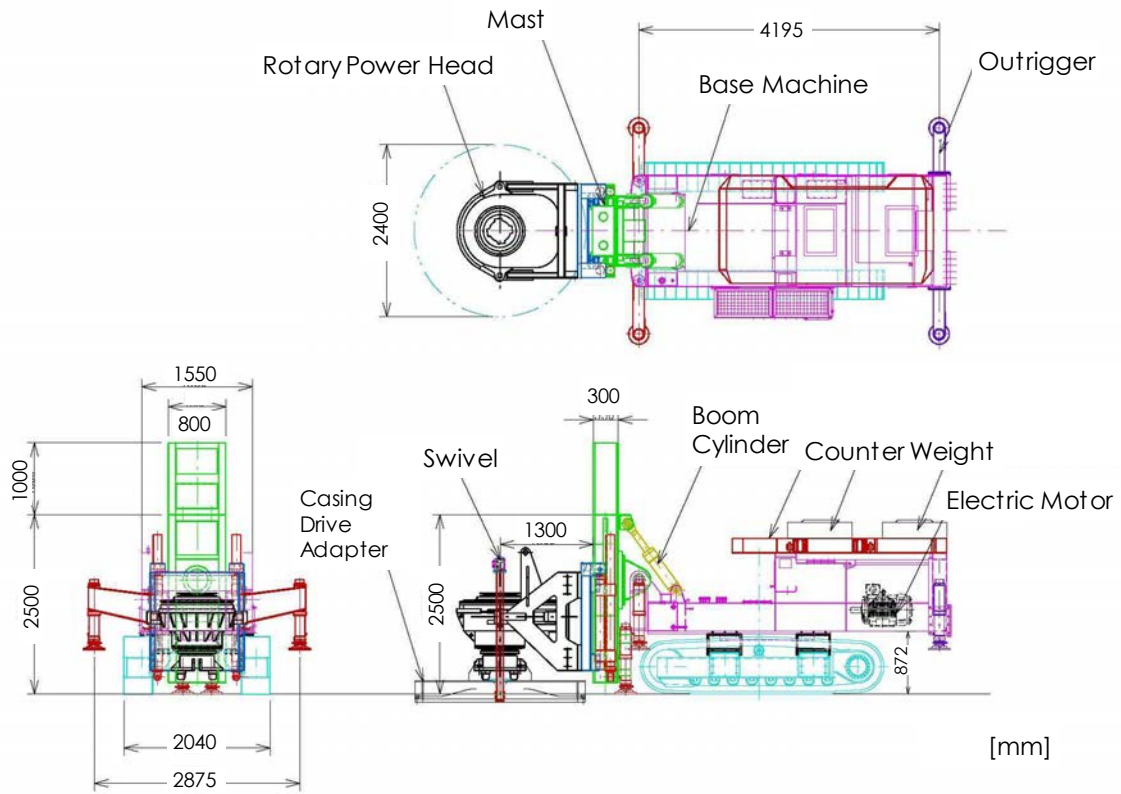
Dimensional data of drilling machine for large diameter³⁾
